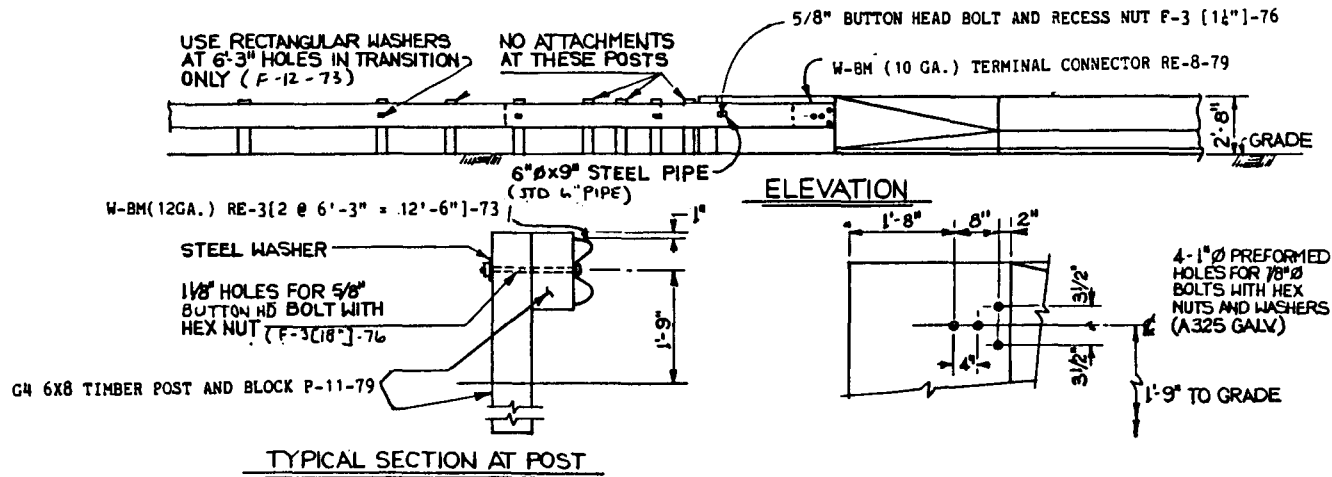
G4(2W) W-beam transition - tapered wingwall.
